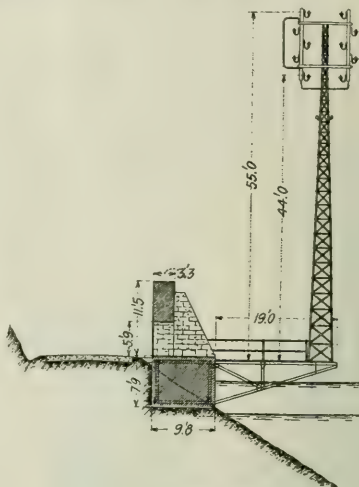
SKETCH OF TRANSMISSION-LINE TOWER ON CANTILEVER SUPPORT.
